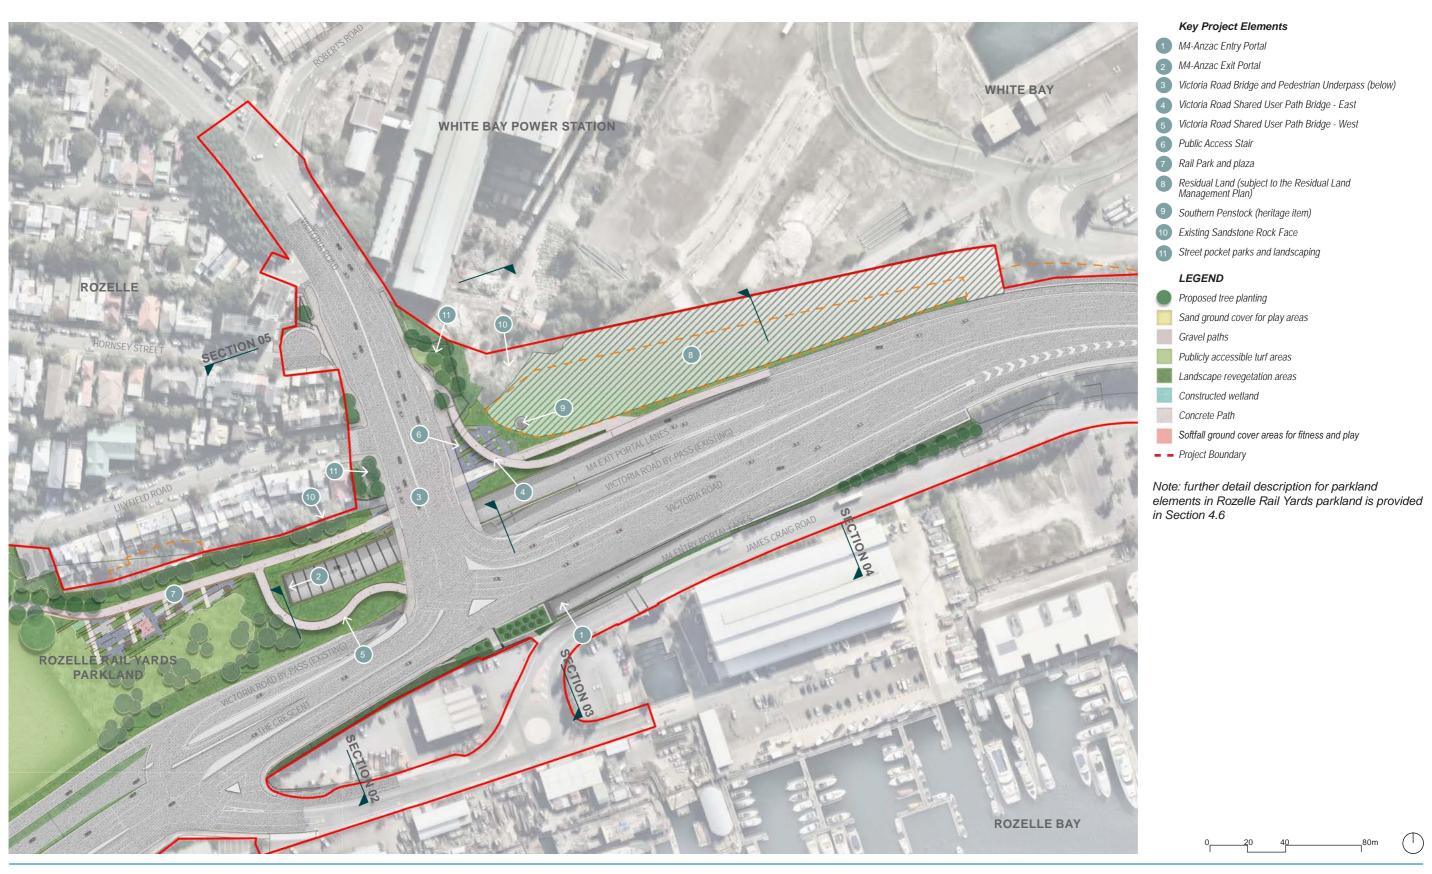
Rozelle - Concept Plan - Drawing 3 of 4
